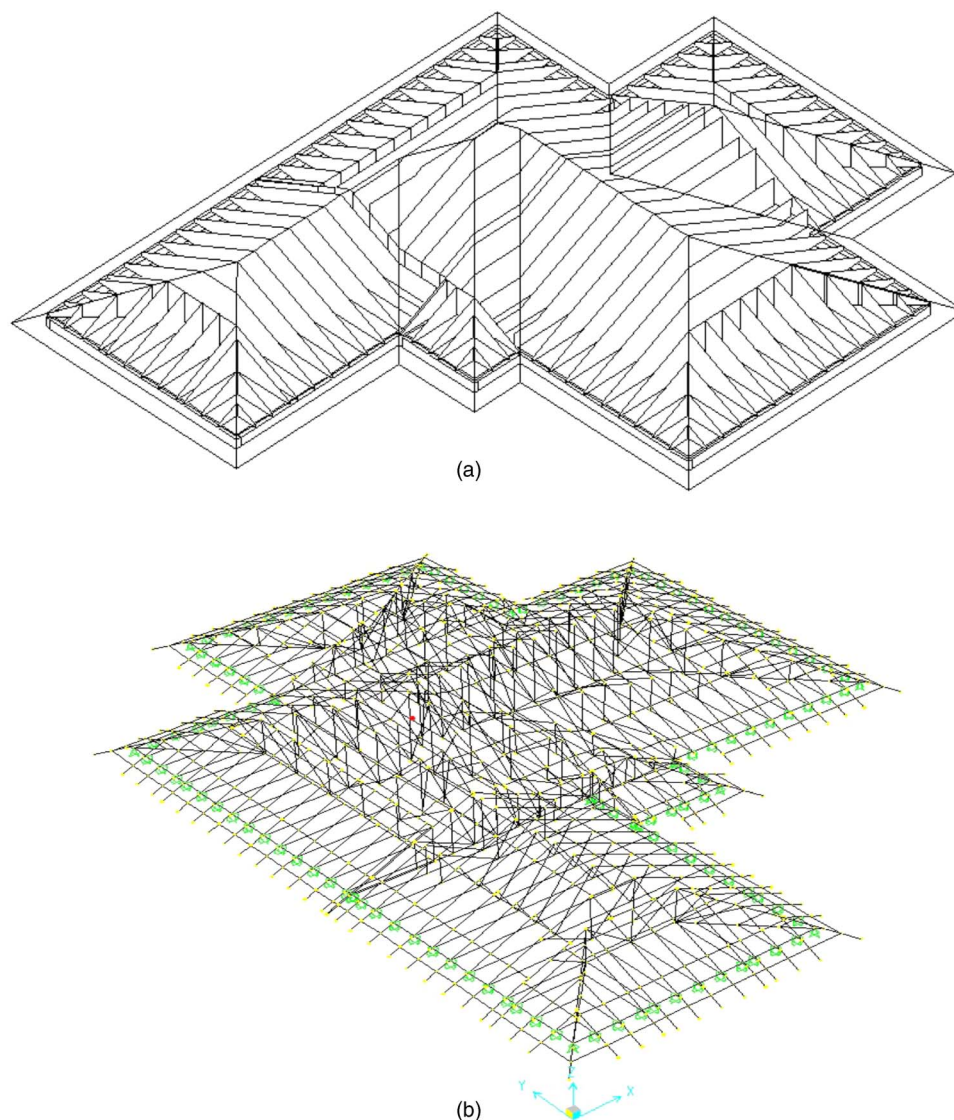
L-shaped assembly: (a) TPM layout; (b) SAP2000 model
